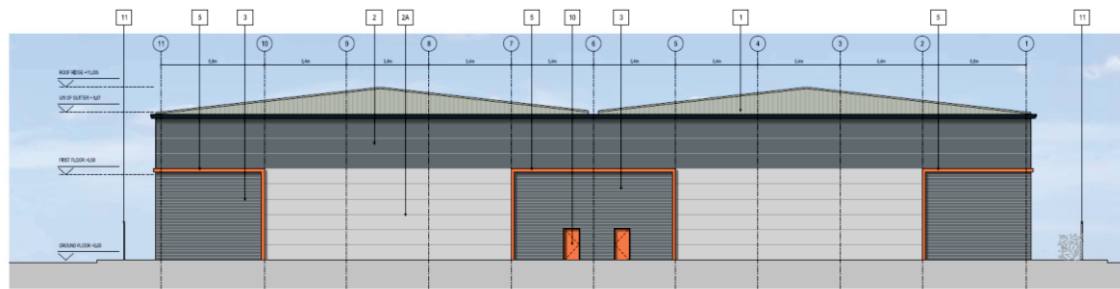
Proposed Plan (please note – larger version of plan can be found in the Committee Plan Pack)
